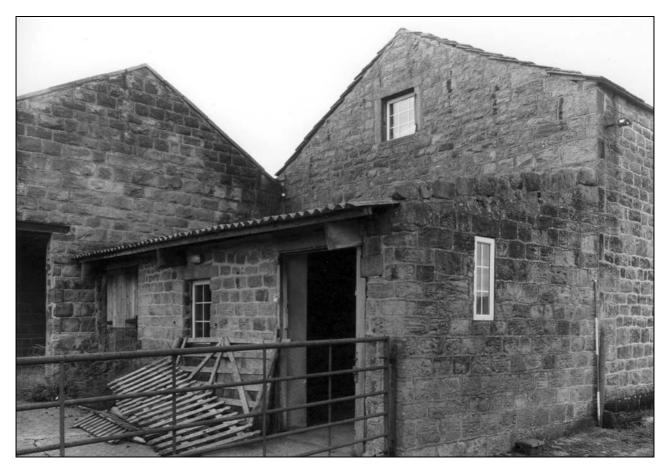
Modern lean-to at south-east gable of barn, looking west (film 2, frame 5)
